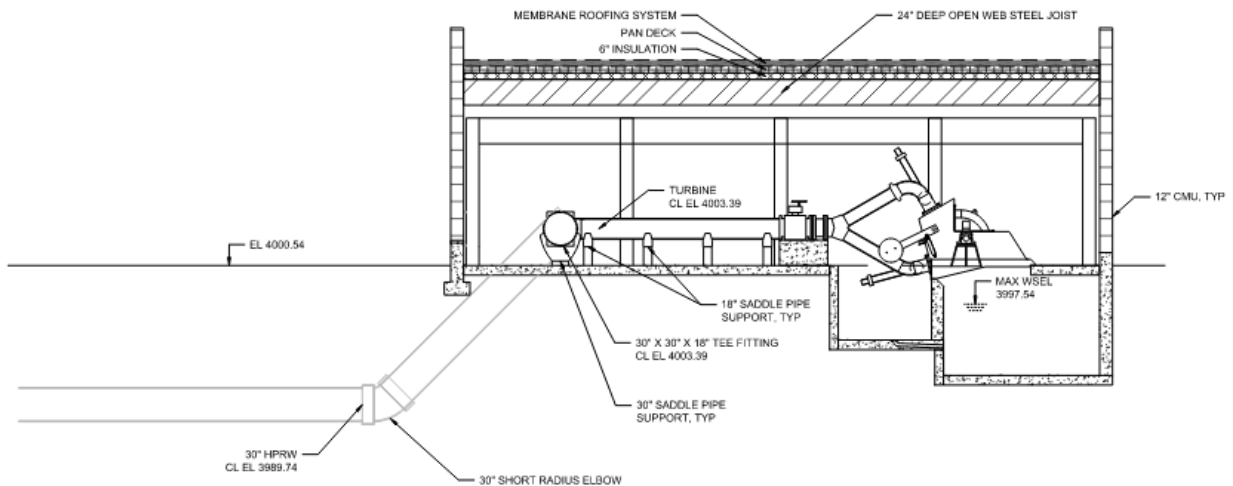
Building Section of Proposed Outback In-conduit Hydropower Facility, Pelton Turbine Assembly
